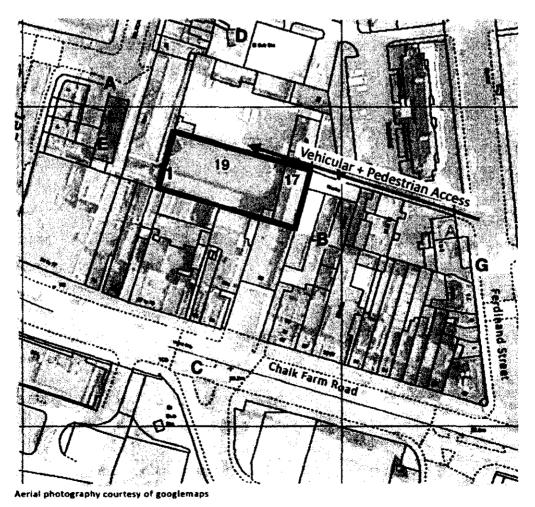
Site Location Plan, 17 & 19 Ferdinand Street, London NW1 8EU
